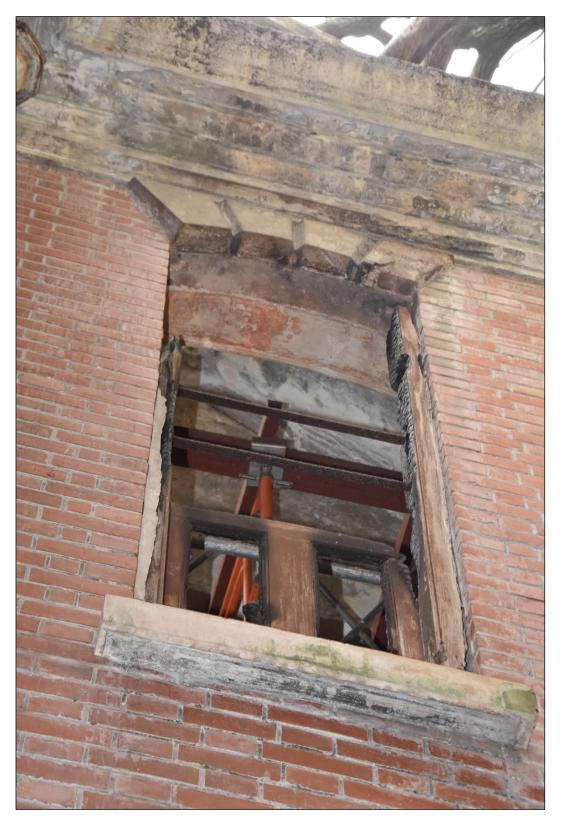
North-west elevation (facing Admiralty side), first floor, window Wdw-1f10, external side, the window and window grille removed, (21st March, 2023)
